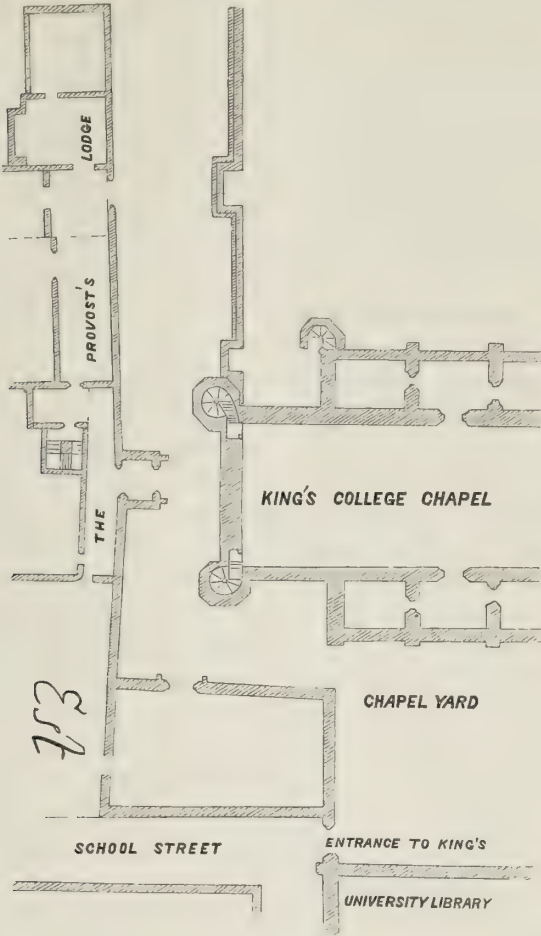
Ground-plan of part of the Provost's Lodge, reduced from the plan of Clare Hall, made about 1635 (fig. 4).
